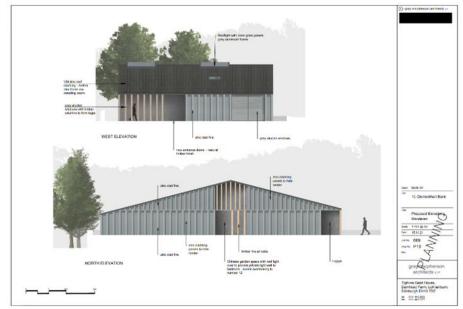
Proposed Rendered West (facing No 10) and North Elevations (facing No 12)
